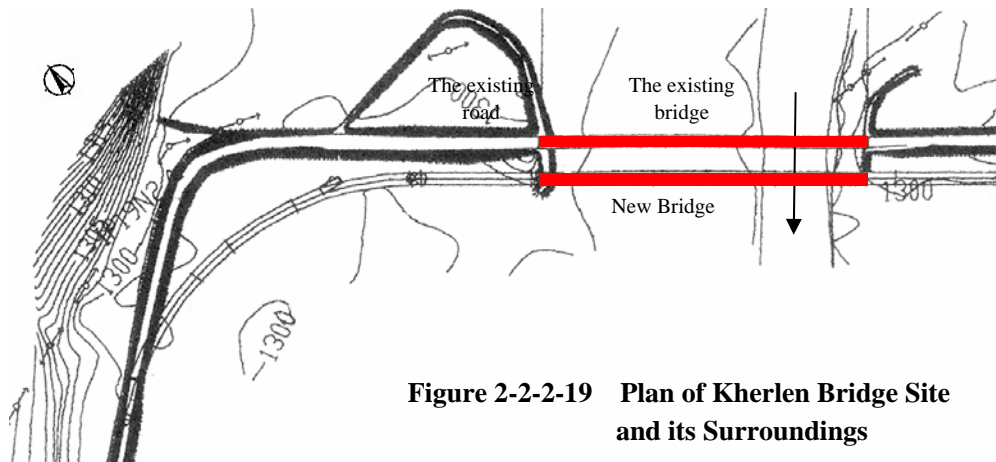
Plan of Kherlen Bridge Site and its Surroundings
